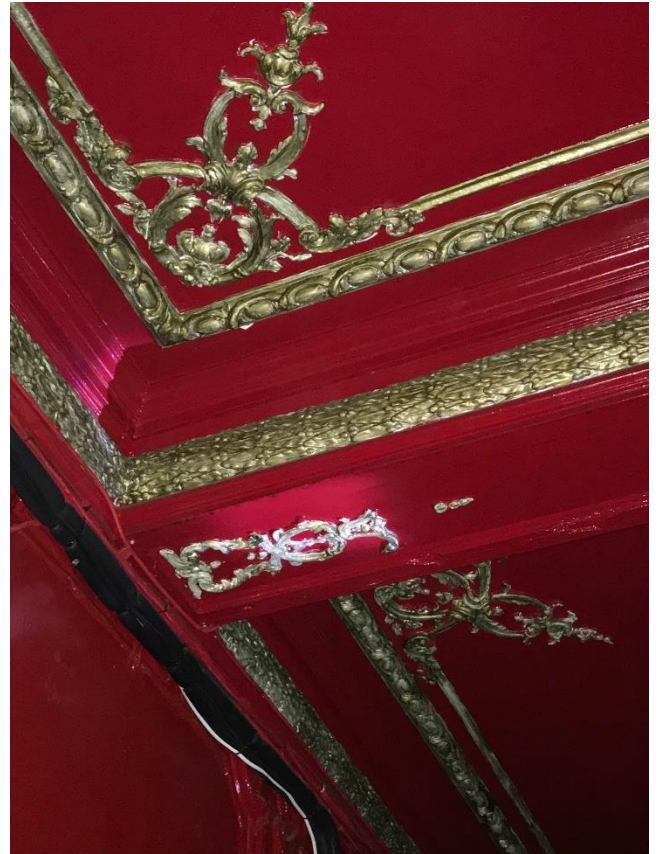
View of the ceiling and decorative fibrous plaster at First floor. The proposed PFCs will intersect the decorative plaster on the ceiling beam. This will be carefully removed and reinstated on the beam in close proximity to its existing position but to allow for the PFC. The works will be undertaken by an appropriate fibrous plaster conservation specialist. If the historic plaster is in poor condition and cannot be removed and reinstated, it will be replicated like-for-like in the new location.
